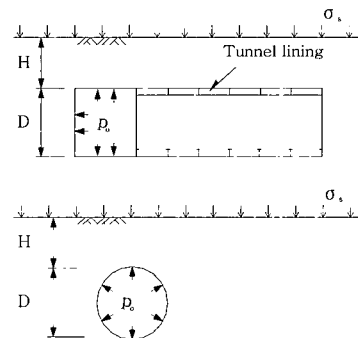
Simplified Geometry for the Face Stability of Shallow Tunnel
